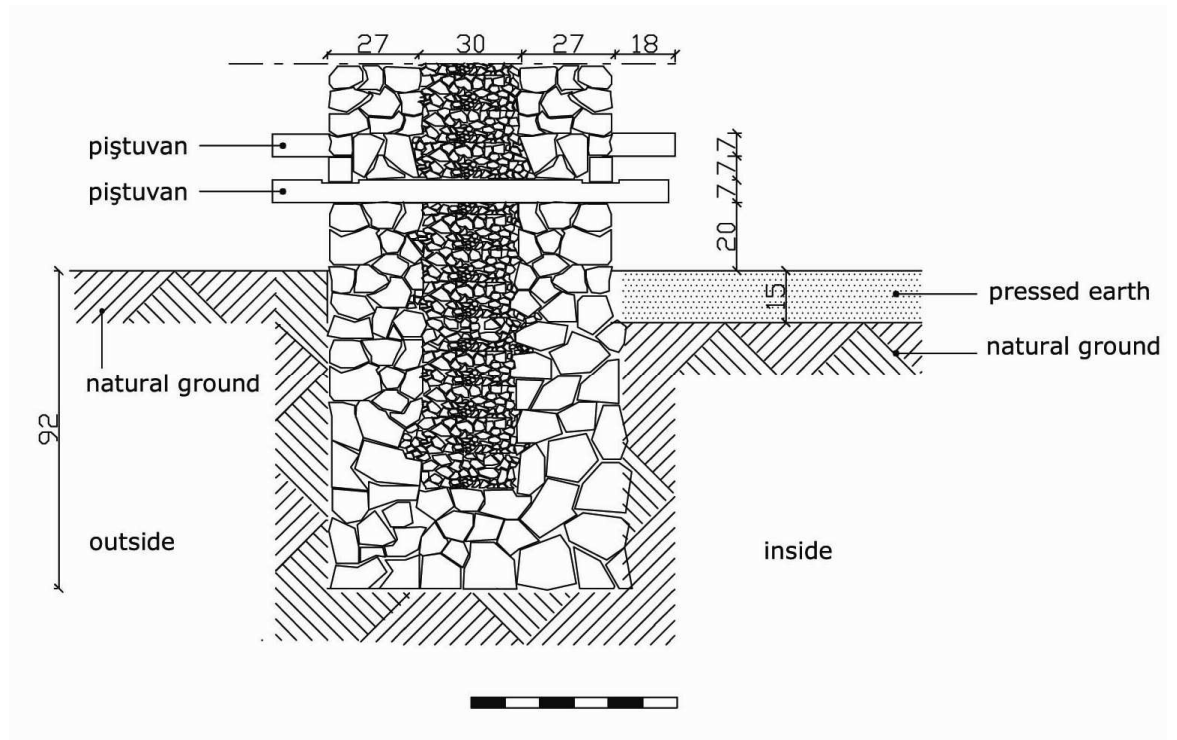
3 Drawing of the foundation type B. Çelik 2008.
